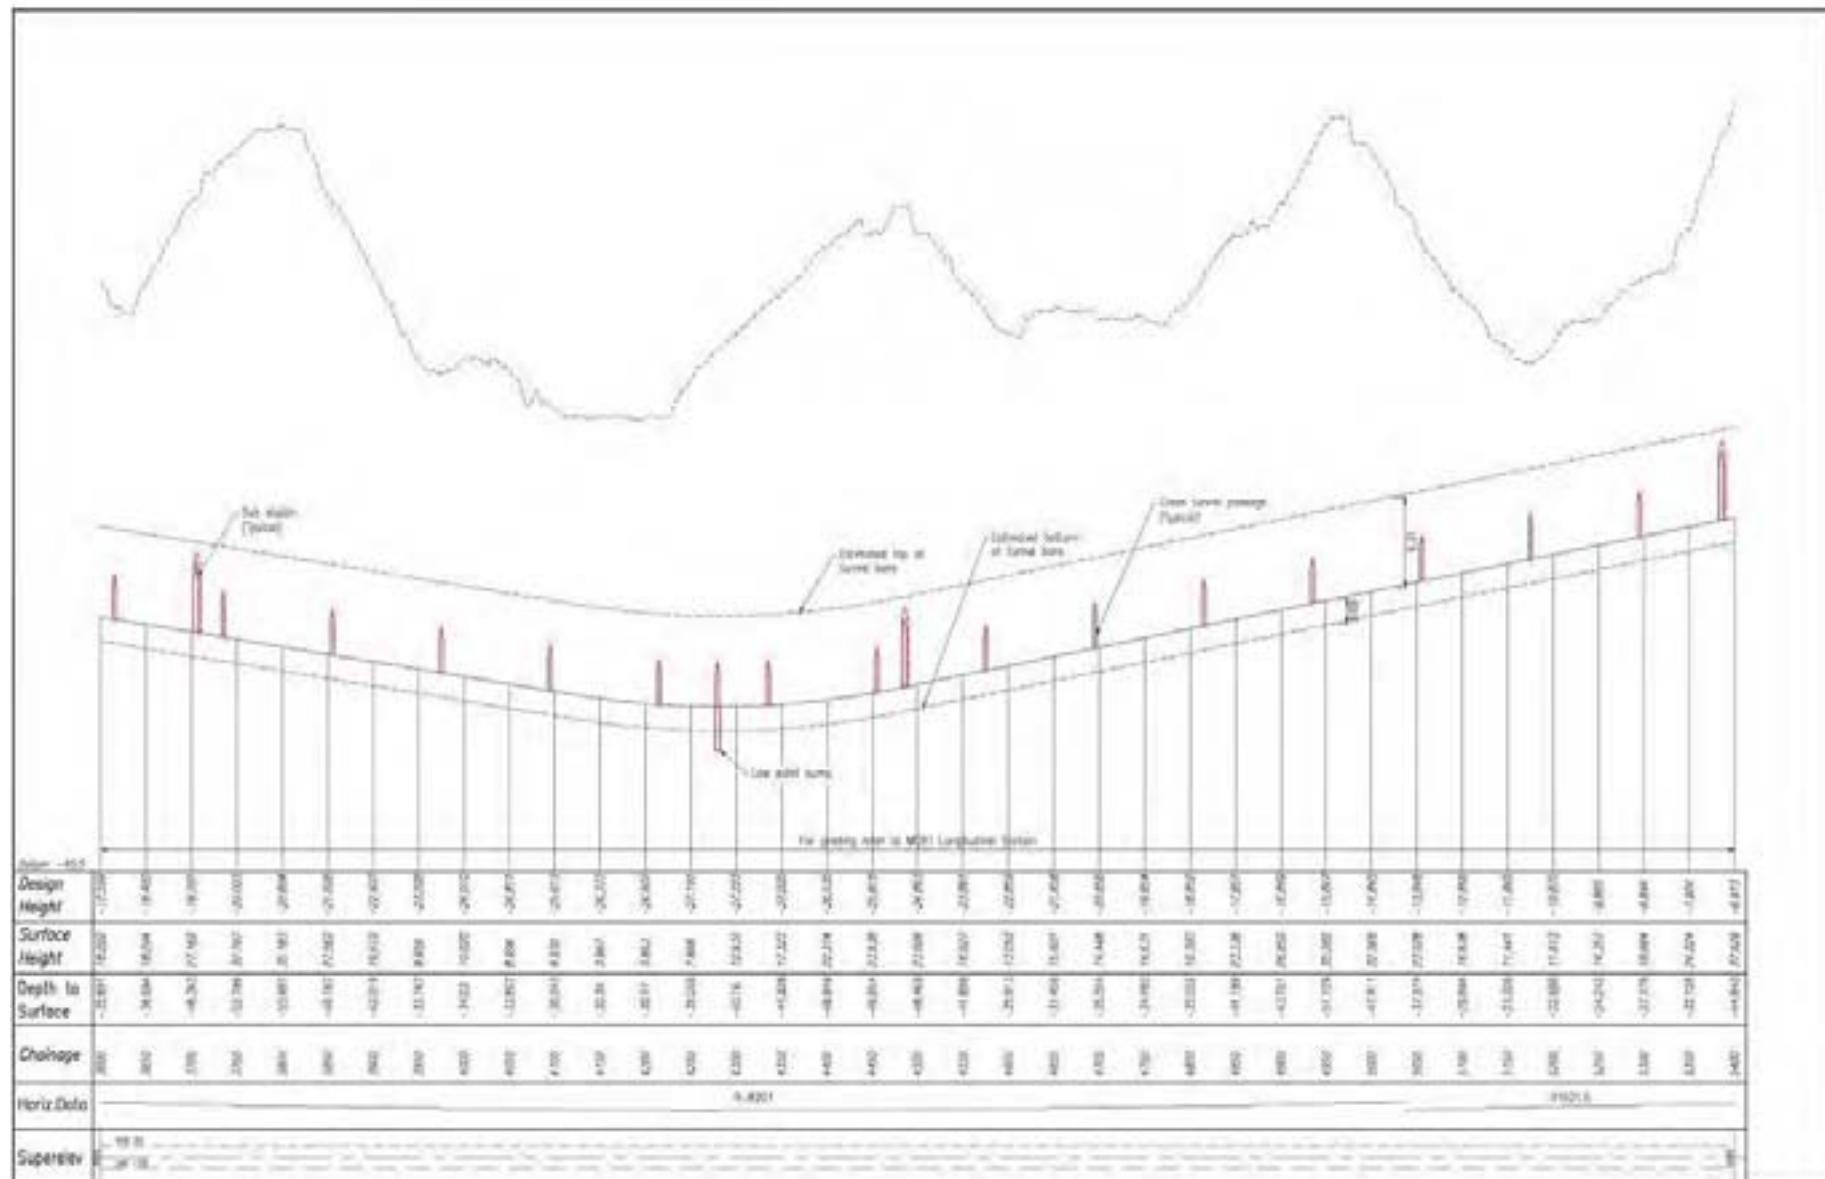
Eastbound tunnel vertical alignment – Thomas Street to Plunkett Street
